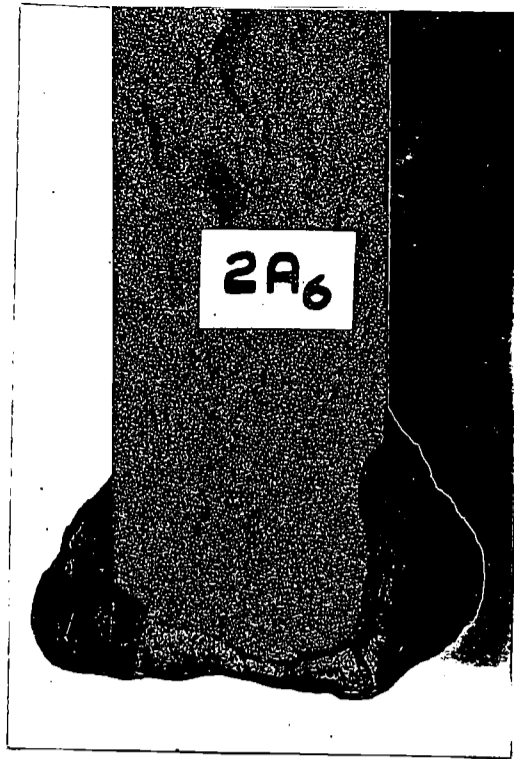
Brittle fracture initiated at fatigue crack.
